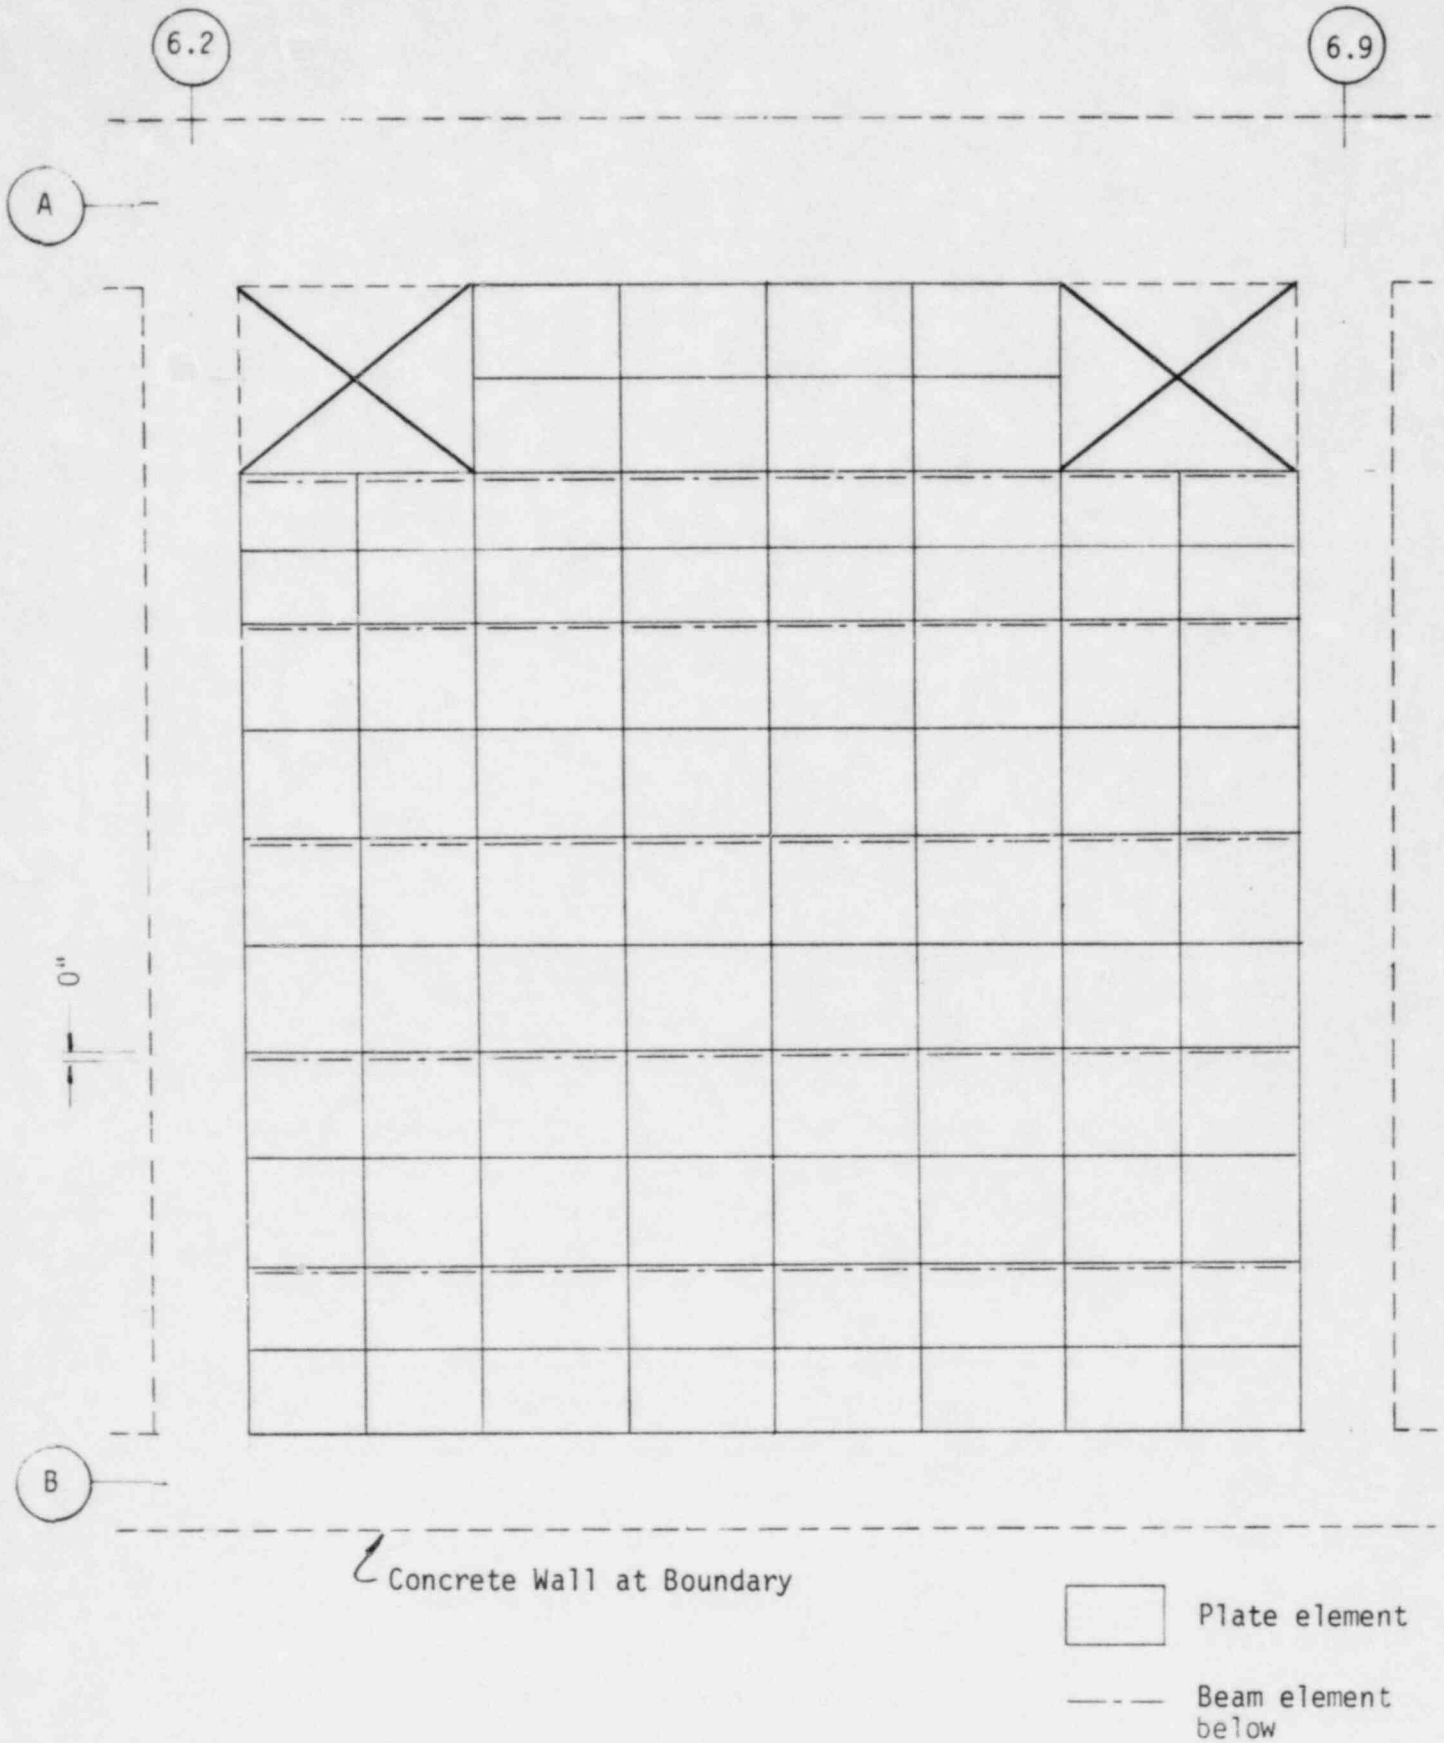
FINITE ELEMENT MESH OF AUXILIARY BUILDING FLOOR AT ELEVATION 584'-0"
